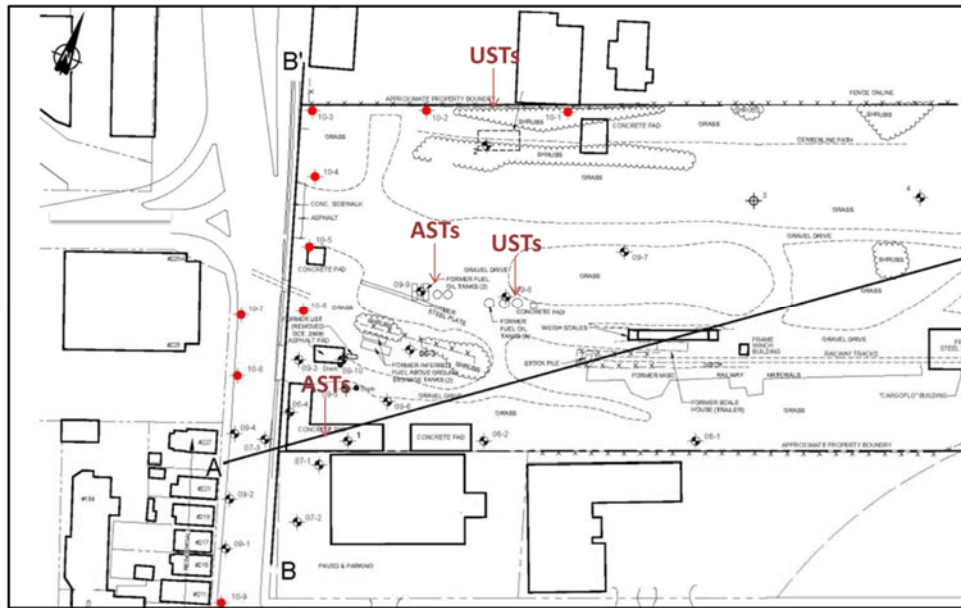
Site layout and location of aboveground storage tanks (ASTs) and underground storage tanks (USTs)
